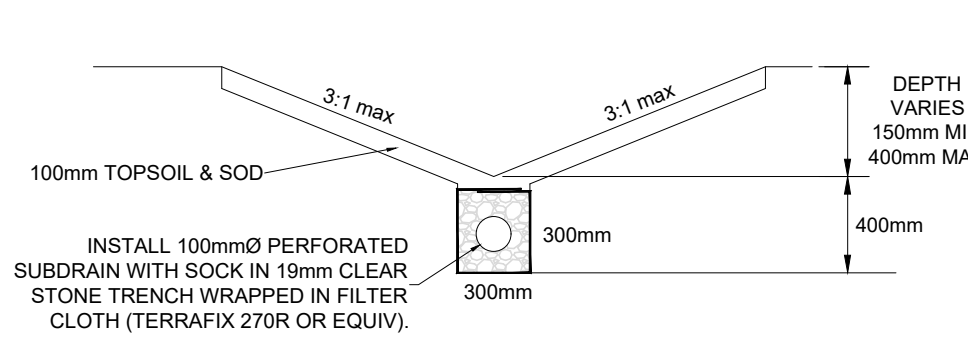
TYPICAL INFILTRATION TRENCH N.T.S.
